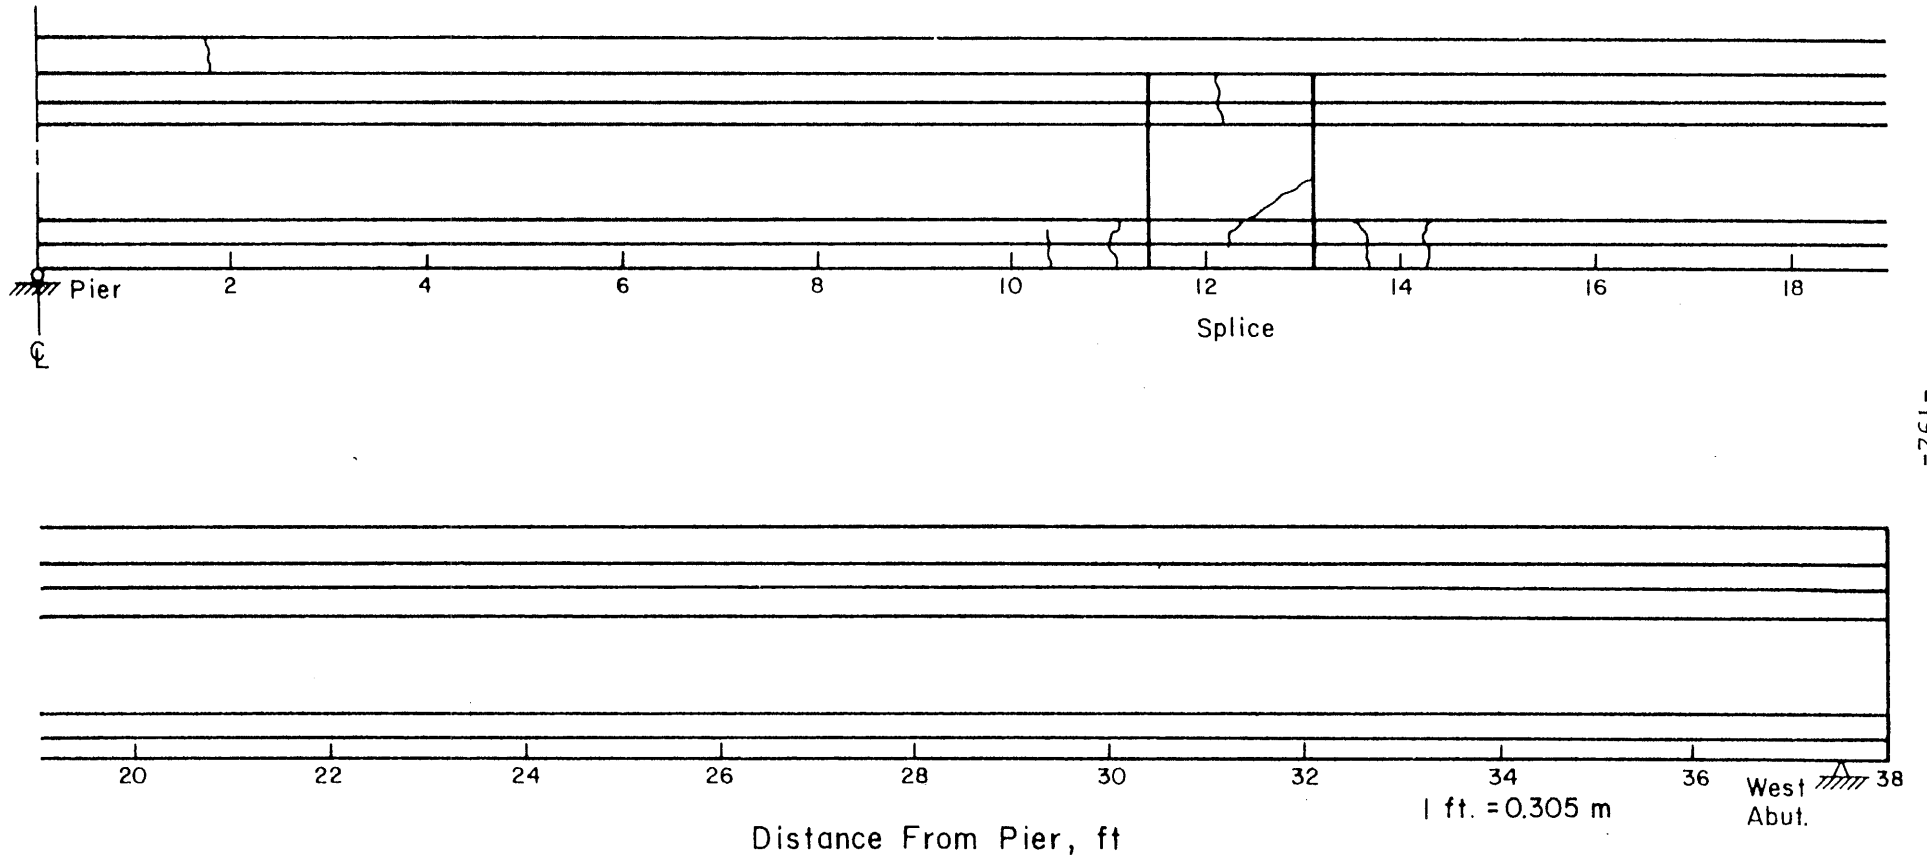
CRACKS IN WEST SPAN OF MODEL 2 DUE TO DEAD LOAD
